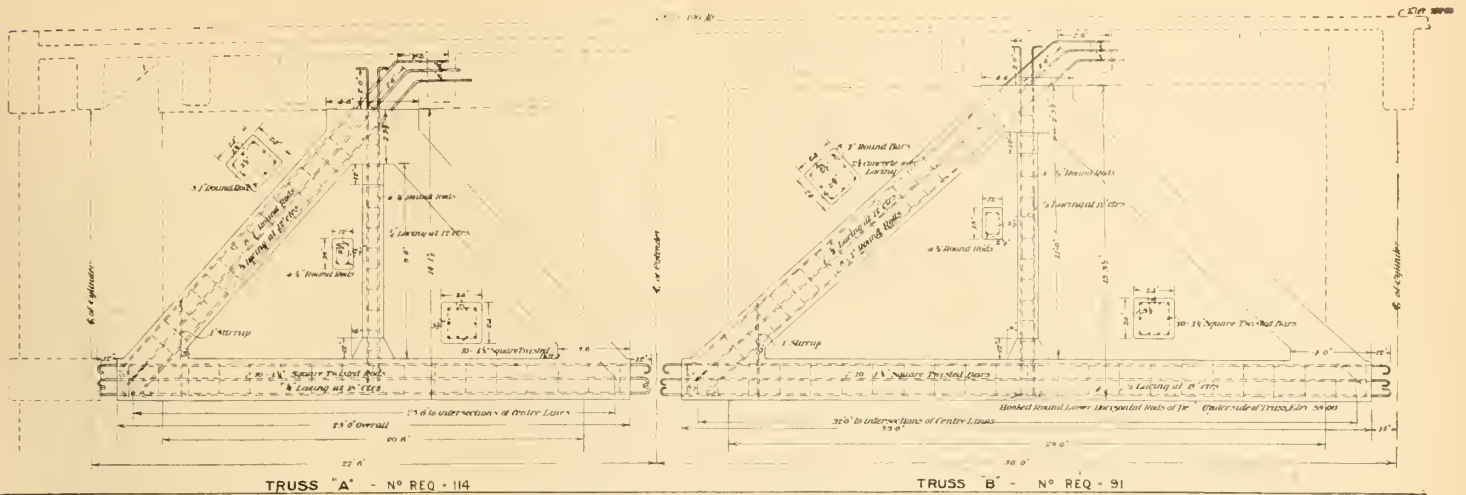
Ballantyne Pier — Details of Pre-Cast Trusses.
